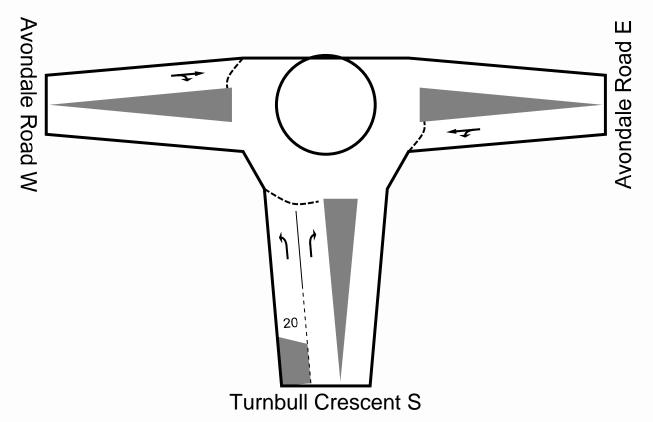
Avondale Road/Turnbull Crescent 2008 Intersection Layout
